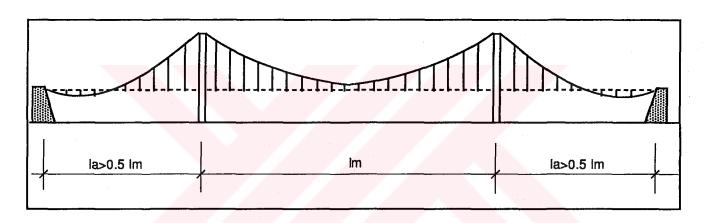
THREE-SPAN SUSPENSION BRIDGE WITH EXTREME SIDE SPANS
